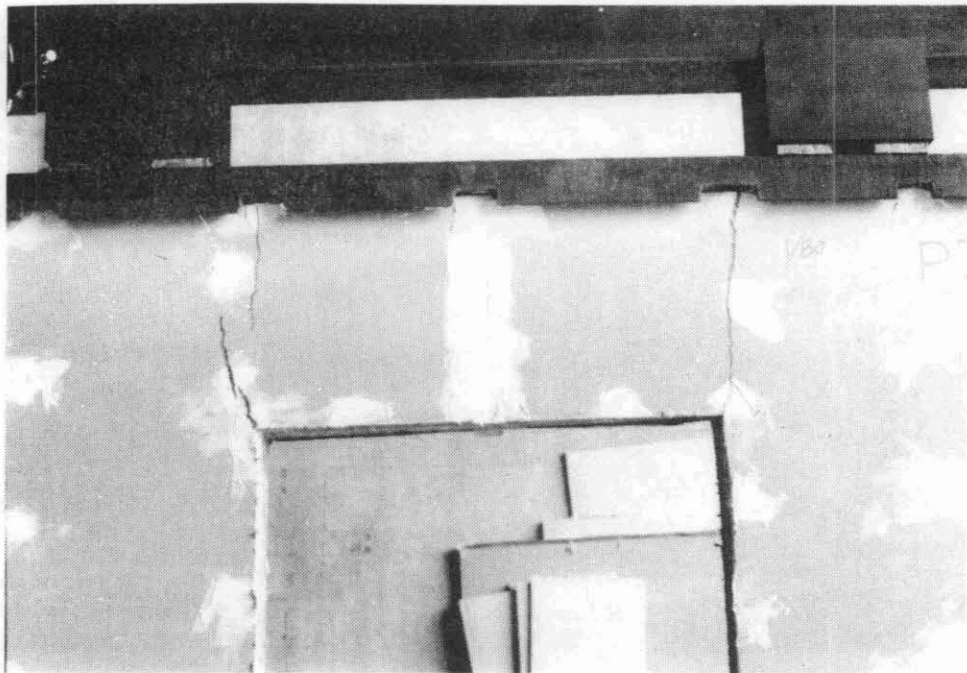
Partition Test Specimen P7: Typical Failure Above Door Opening (Front View)
